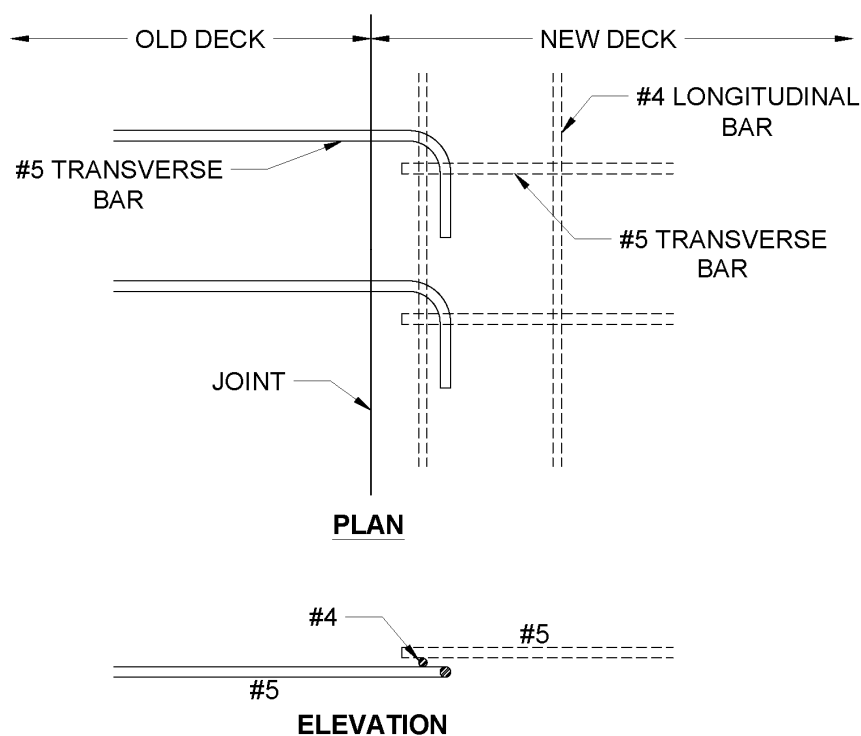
90-Degree Dowel Bar Reinforcing Detail (Adapted from Furr and Fouad 1981)
